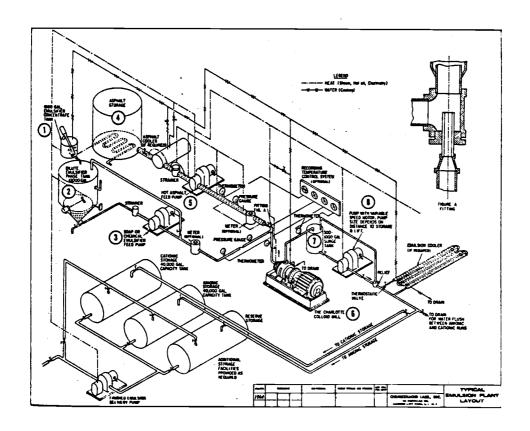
Typical emulsified asphalt plant layouts.(30)
